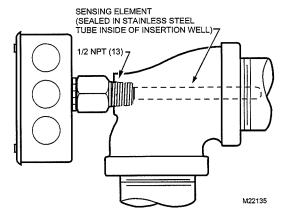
Method of mounting C7021D, C7023D, C7031D, C7041D Sensor.
